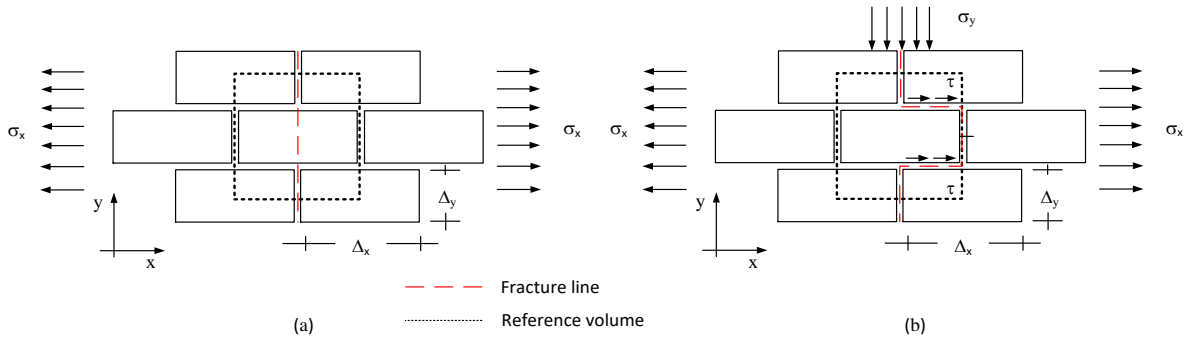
Failure at the interface between the end section and the contiguous masonry material due to tensile failure of the block (a) and failure of the bed joints in shear (b) ( Cattari, 2007).
